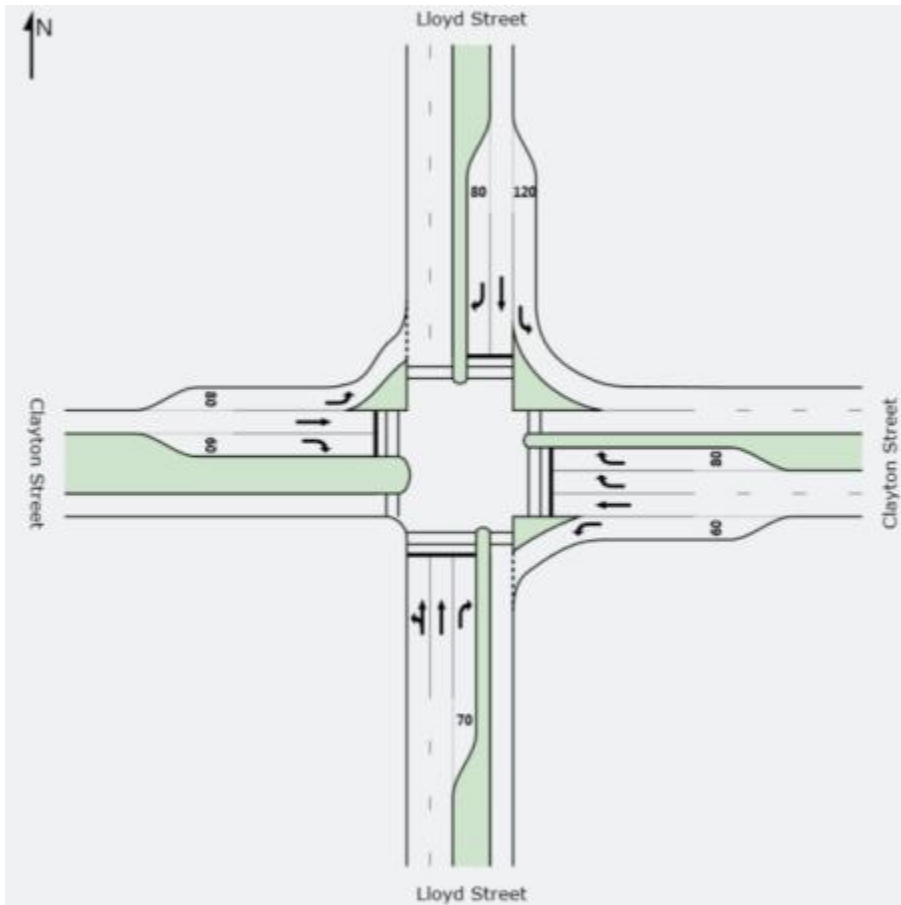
Lloyd Street / Clayton Street – Mitigated Geometry
